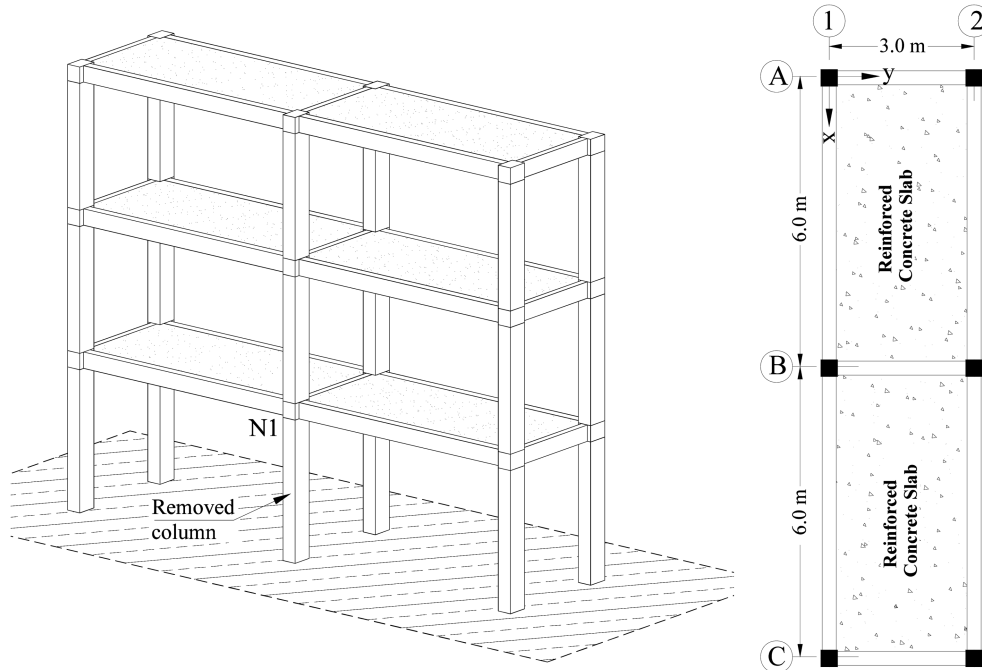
Plan and outline of the 3-storey building model in LS-DYNA (Shi *et al.* 2008)
